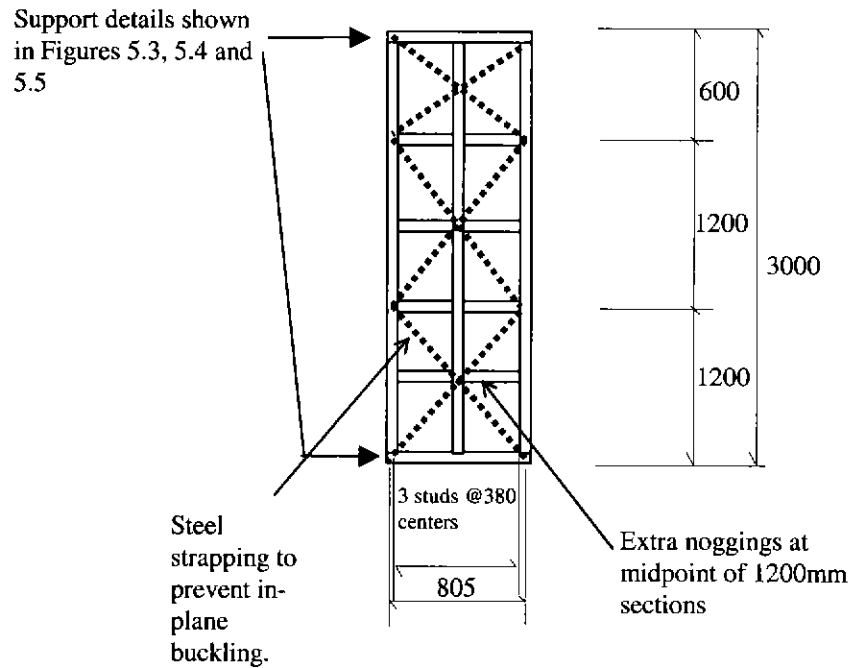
Elevation of Typical Unsheeted Wall Frame Construction Detail
